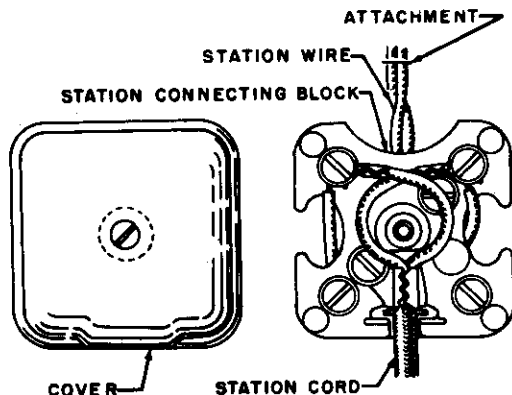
Typical Conductor Terminations at Station Connecting Block
